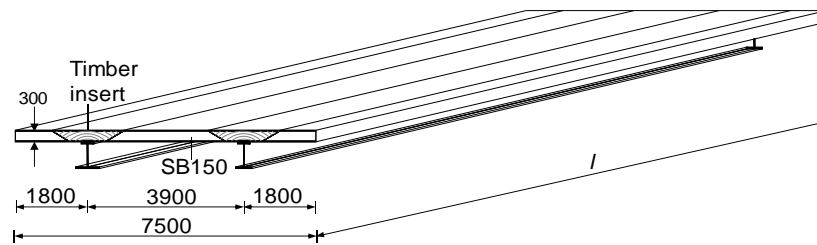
Sandwich bridge concepts for D-TI deck on steel girders (dimensions in mm)
